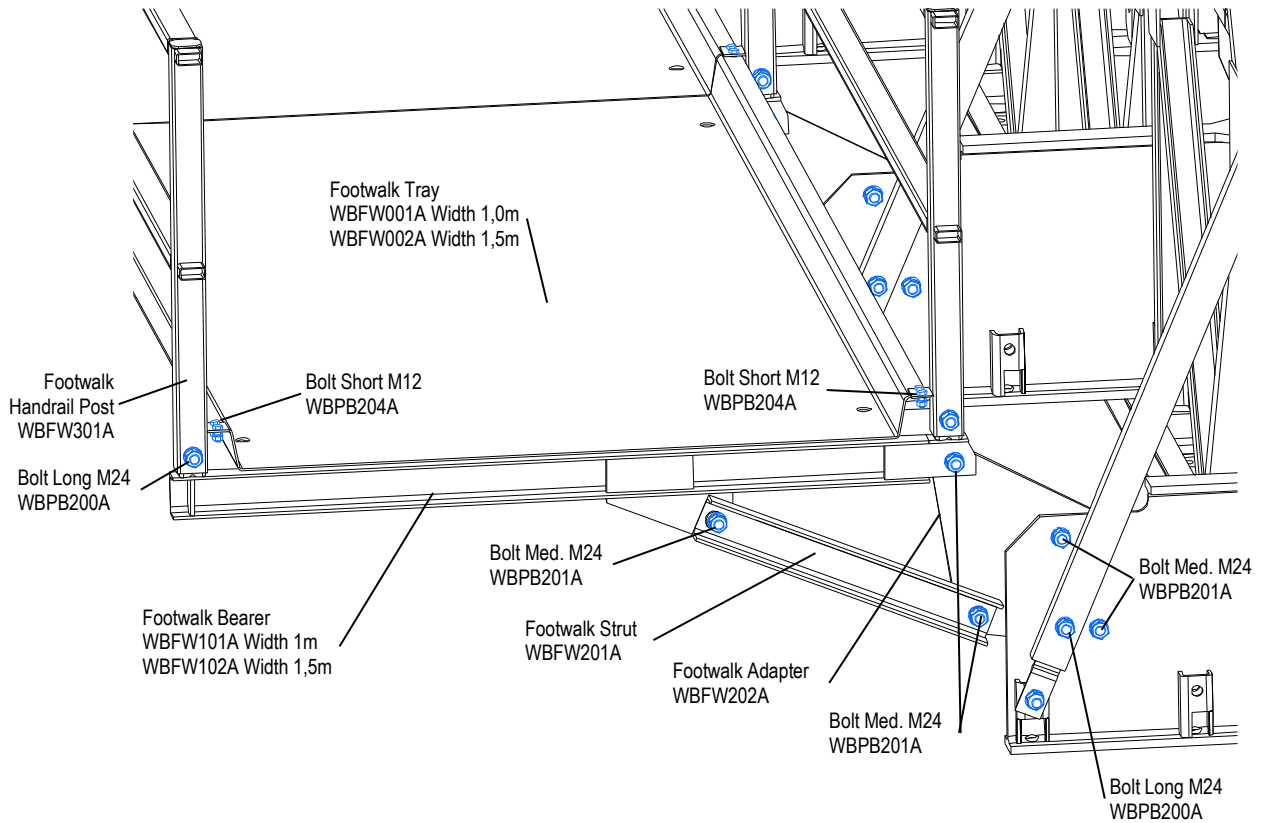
FOOTWALK DETAIL DOUBLE WIDE TRANSOM
